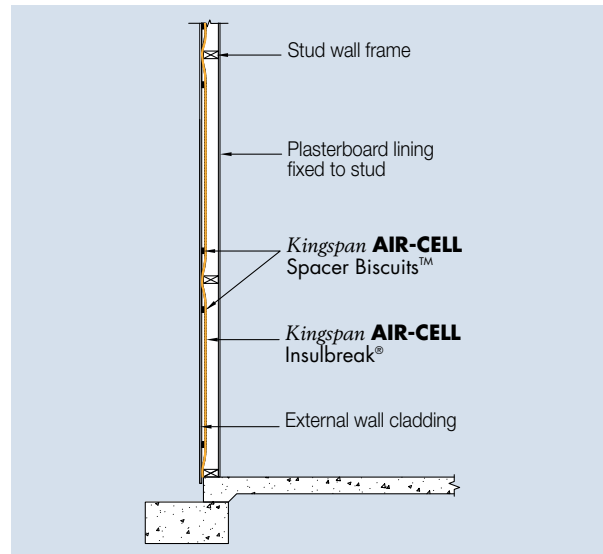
Side elevation of Kingspan AIR-CELL Insulbreak® on steel-framed wall
